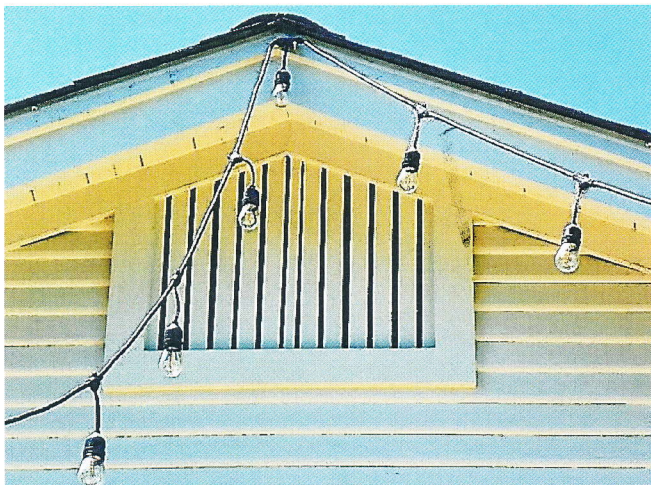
3093; View: Wooden horizontal Attic Vent;
